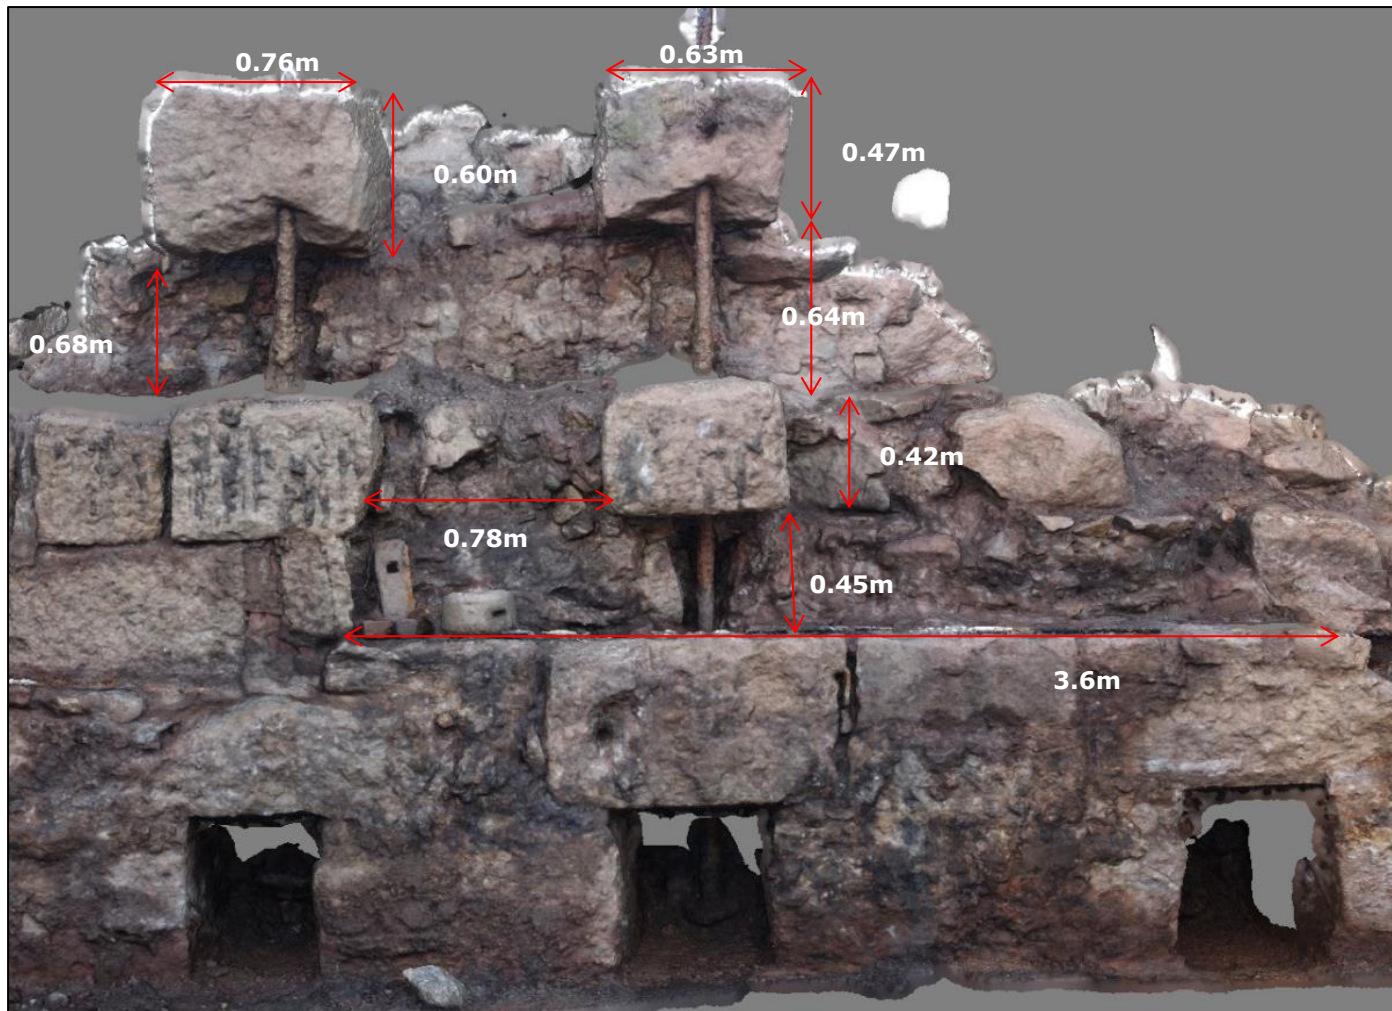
West elevation of man-engine building: close up of 'crow holes' and power train loadings.
